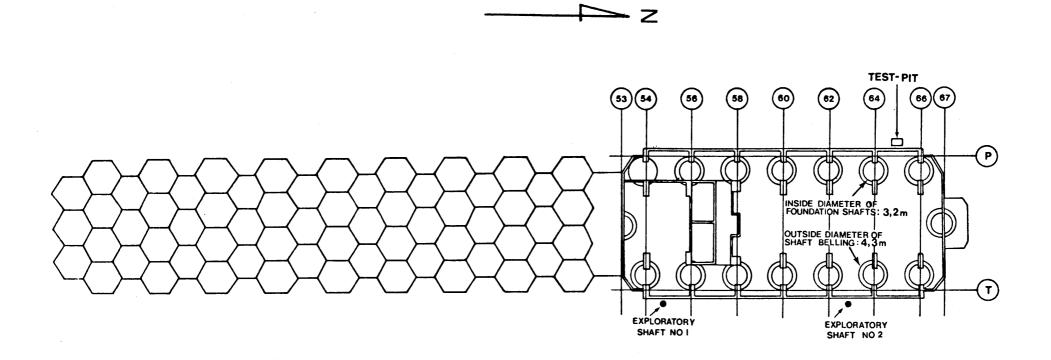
/38 Site plan showing layout of mill building and silo complex and positions of exploratory shafts, Randfontein
